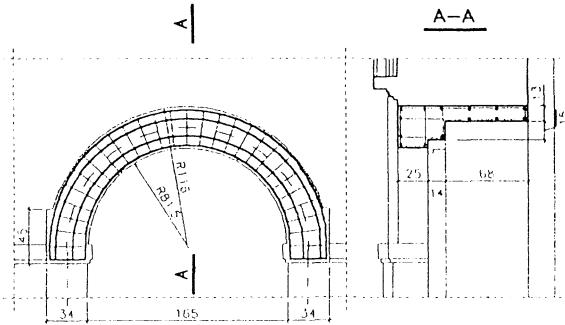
Construction of the RC band around the upper part of the foundation walls.
